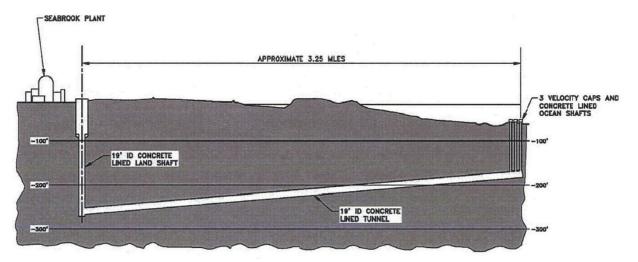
Profile of intake tunnel and shafts at Seabrook
